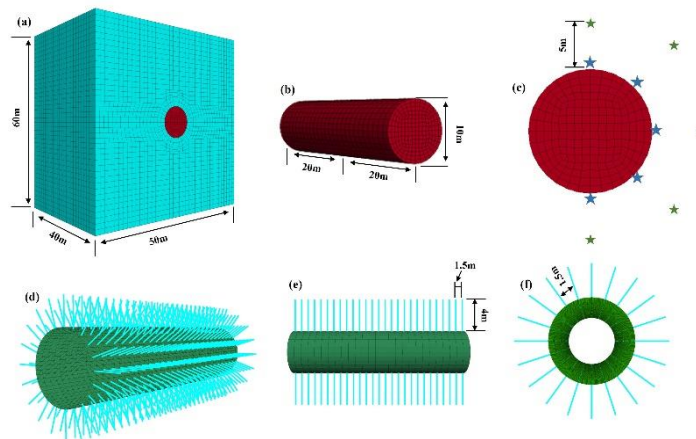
Numerical model of tunnel excavation: (a) Model size, (b) Tunnel shape and size, (c) Arrangement of monitoring points, (d) Lining and anchor bolt support, (e) Bolt length and longitudinal distribution spacing and (f) Bolt distribution spacing on one section
